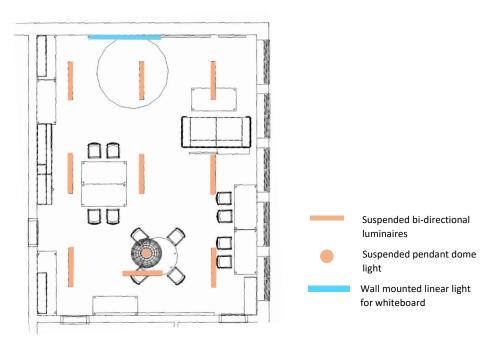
Lighting plan for existing lighting scheme in secondary classroom
